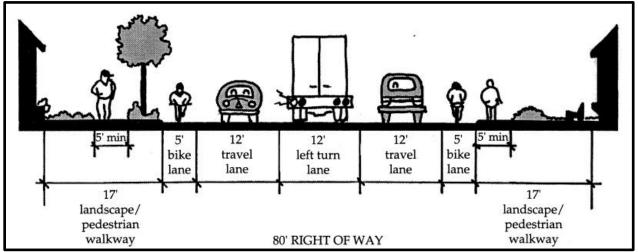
2002 Gualala Town Plan State Route 1 streetscape cross section.
